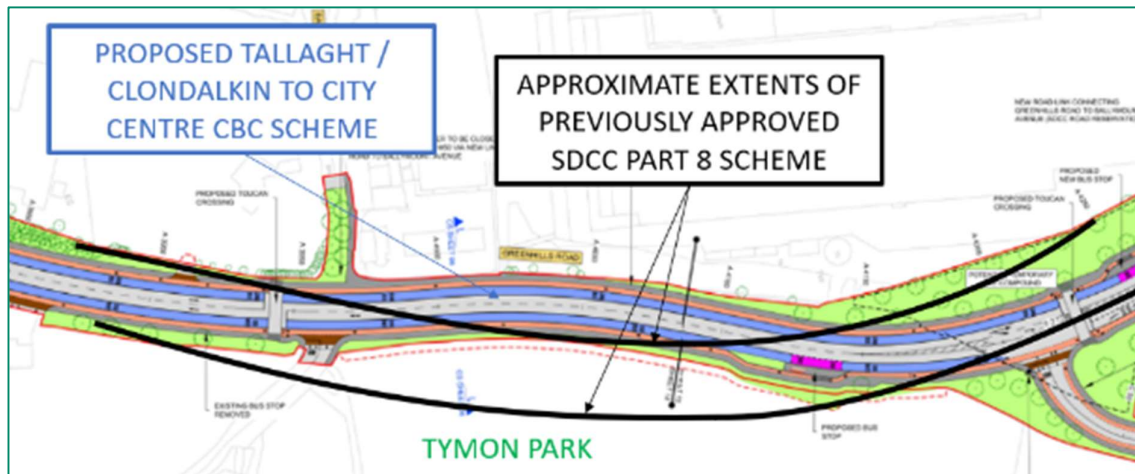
Extract of Sheets 12 & 13 of the General Arrangement Drawings
